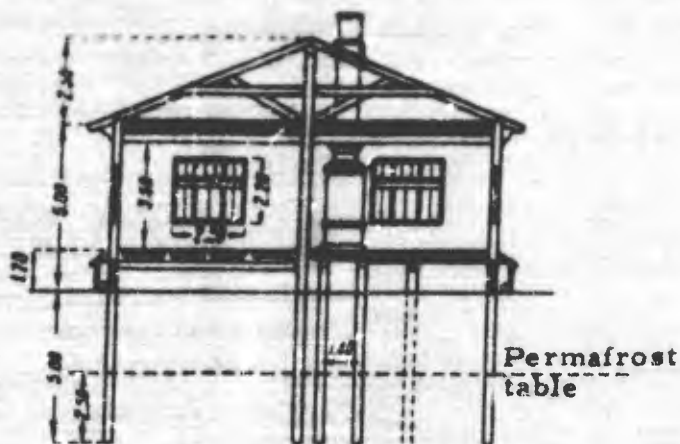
Cross section of the experimental house at the Skovorodino Frozen Ground Station.
